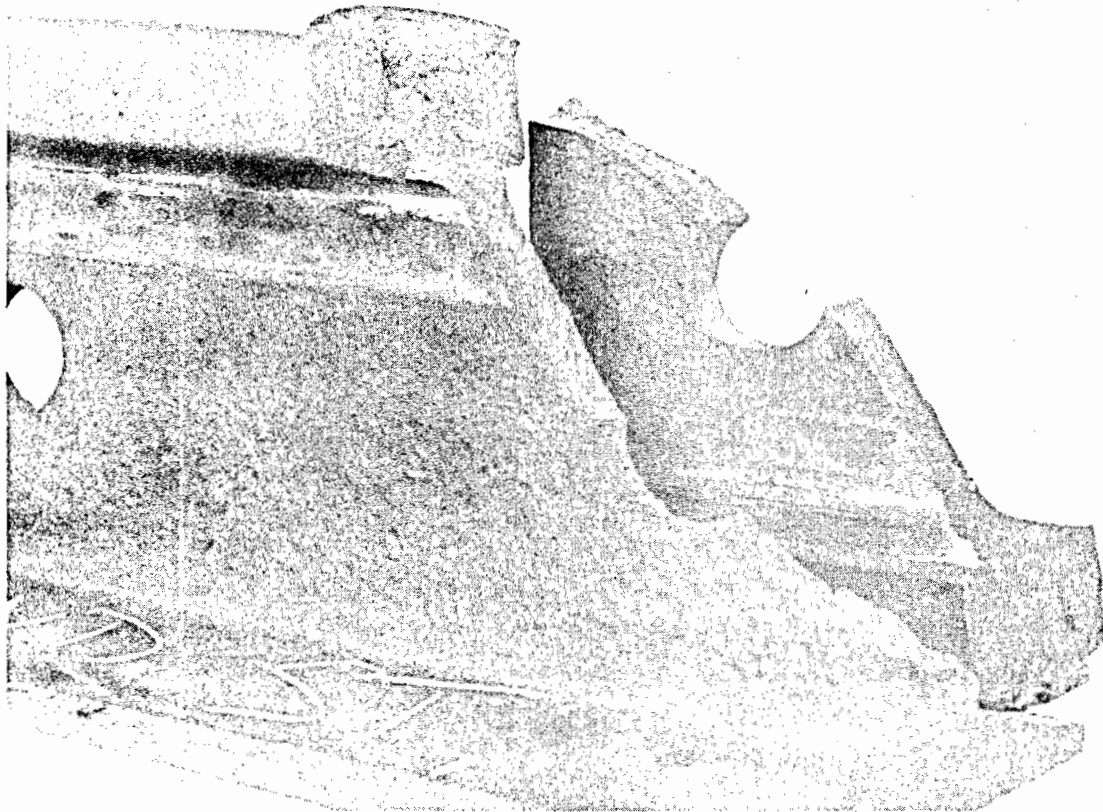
A Bolt Hole Fracture from the First Hole in a 100 lb/yd Standard Carbon Rail.
